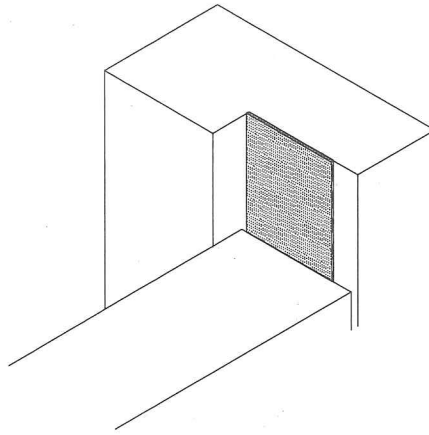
Surface mounted intumescent seal bonded to frame rebate
